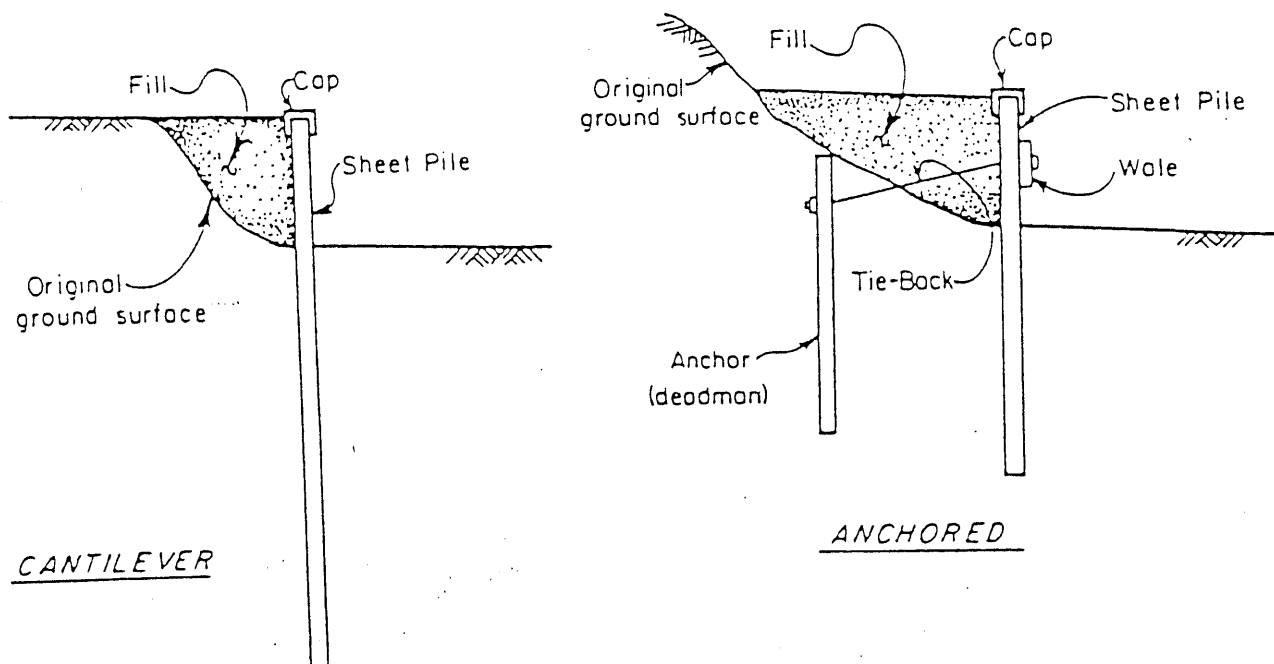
Cross section of a cantilever and an anchored seawall. If timber is used for the sheet piling, a filter cloth backing should be placed behind the timbers on the land side.
